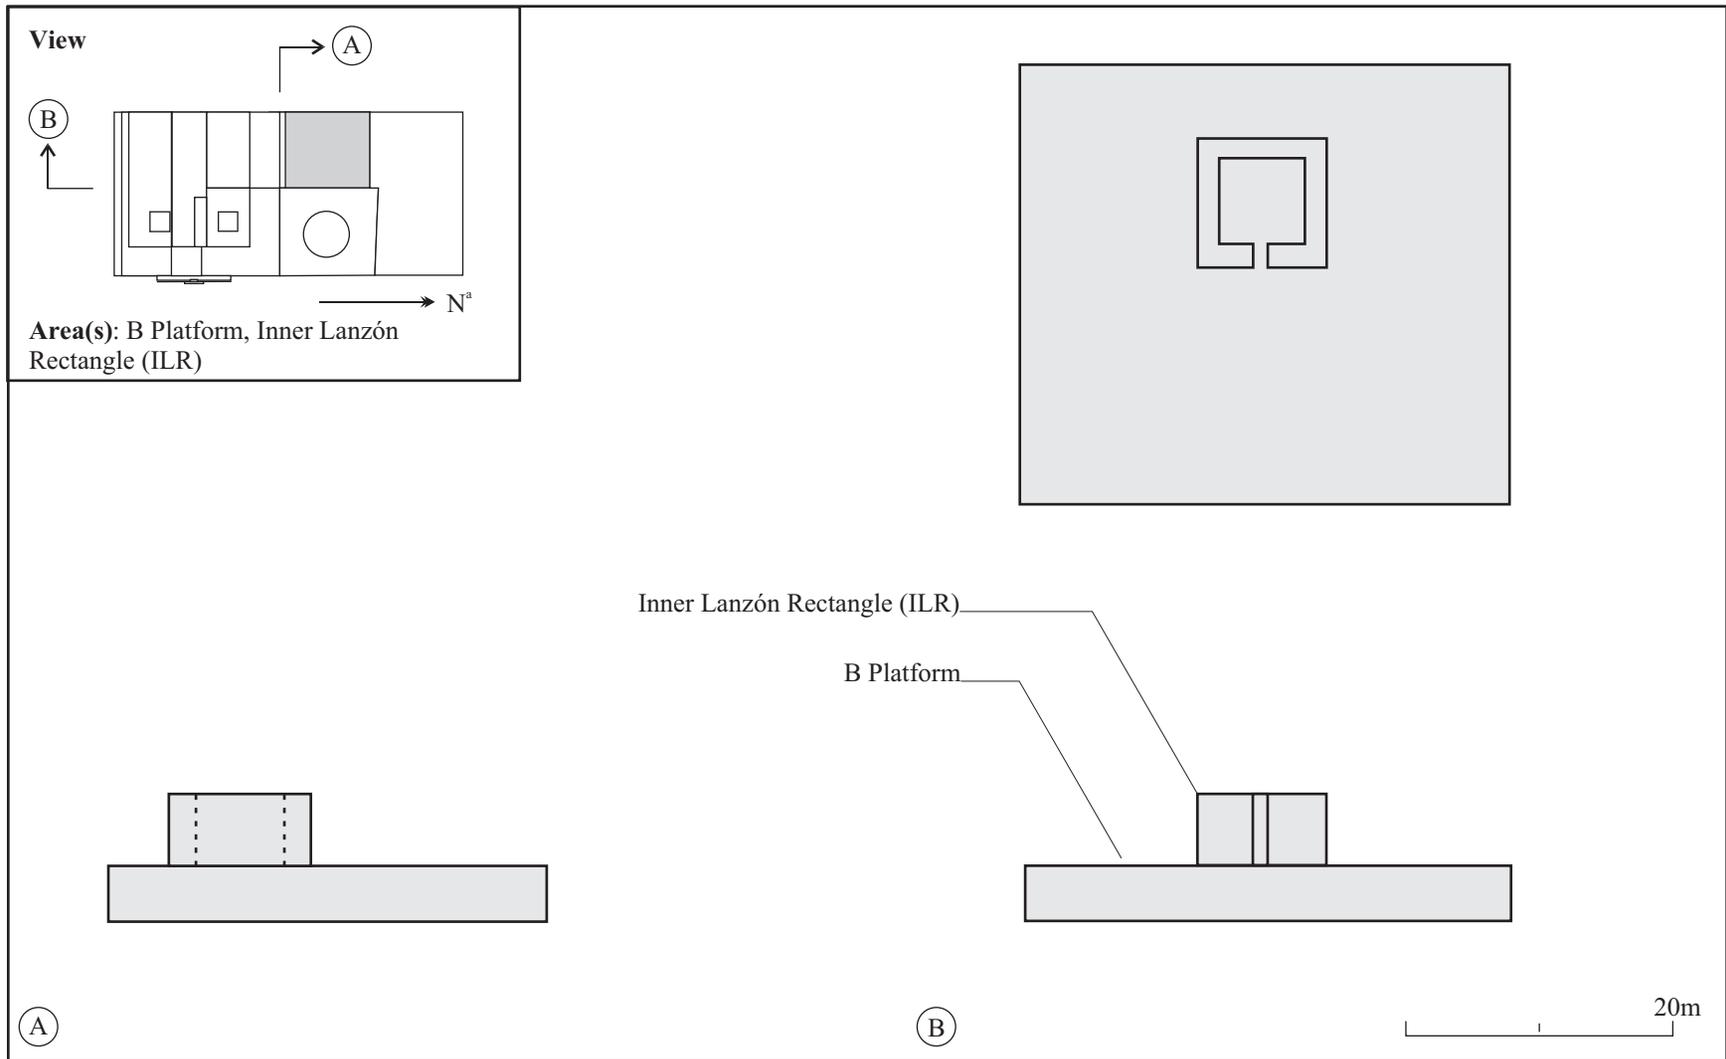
Building B Construction Phase 1: B Platform-ILR Phase.
